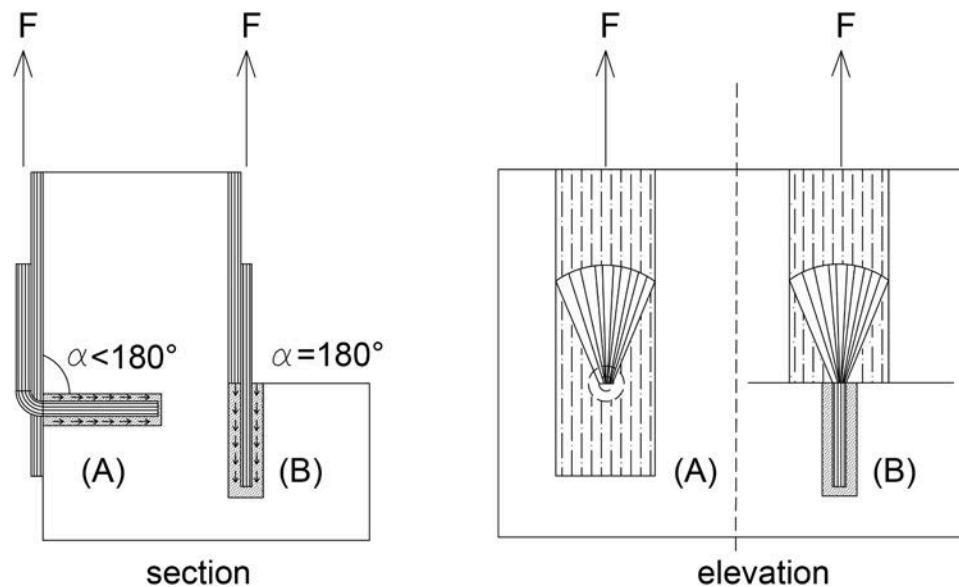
Anchor spikes in different constructive configurations subjected to different type of load: (A) shear stress; (B) pull-out stress.
